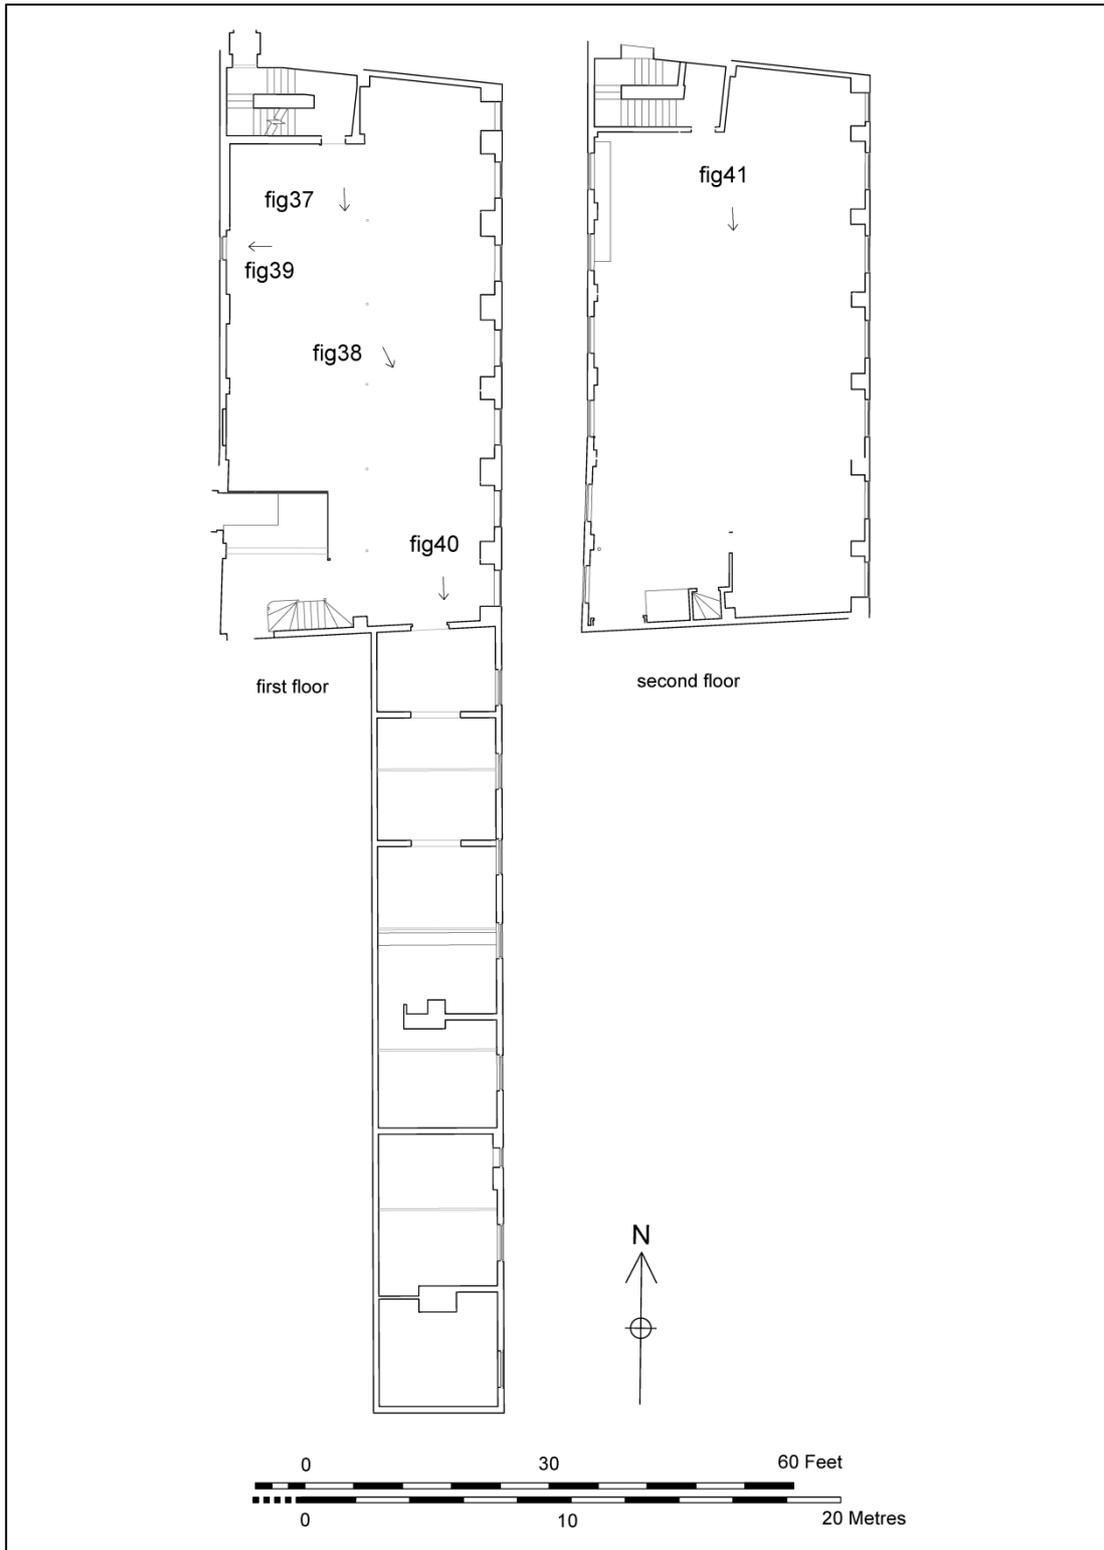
Location of selected photographs (figs 37-41) on first and second floor plans of Bath Lane Mill and Cottages (plan produced by Greenhatch Architects).
